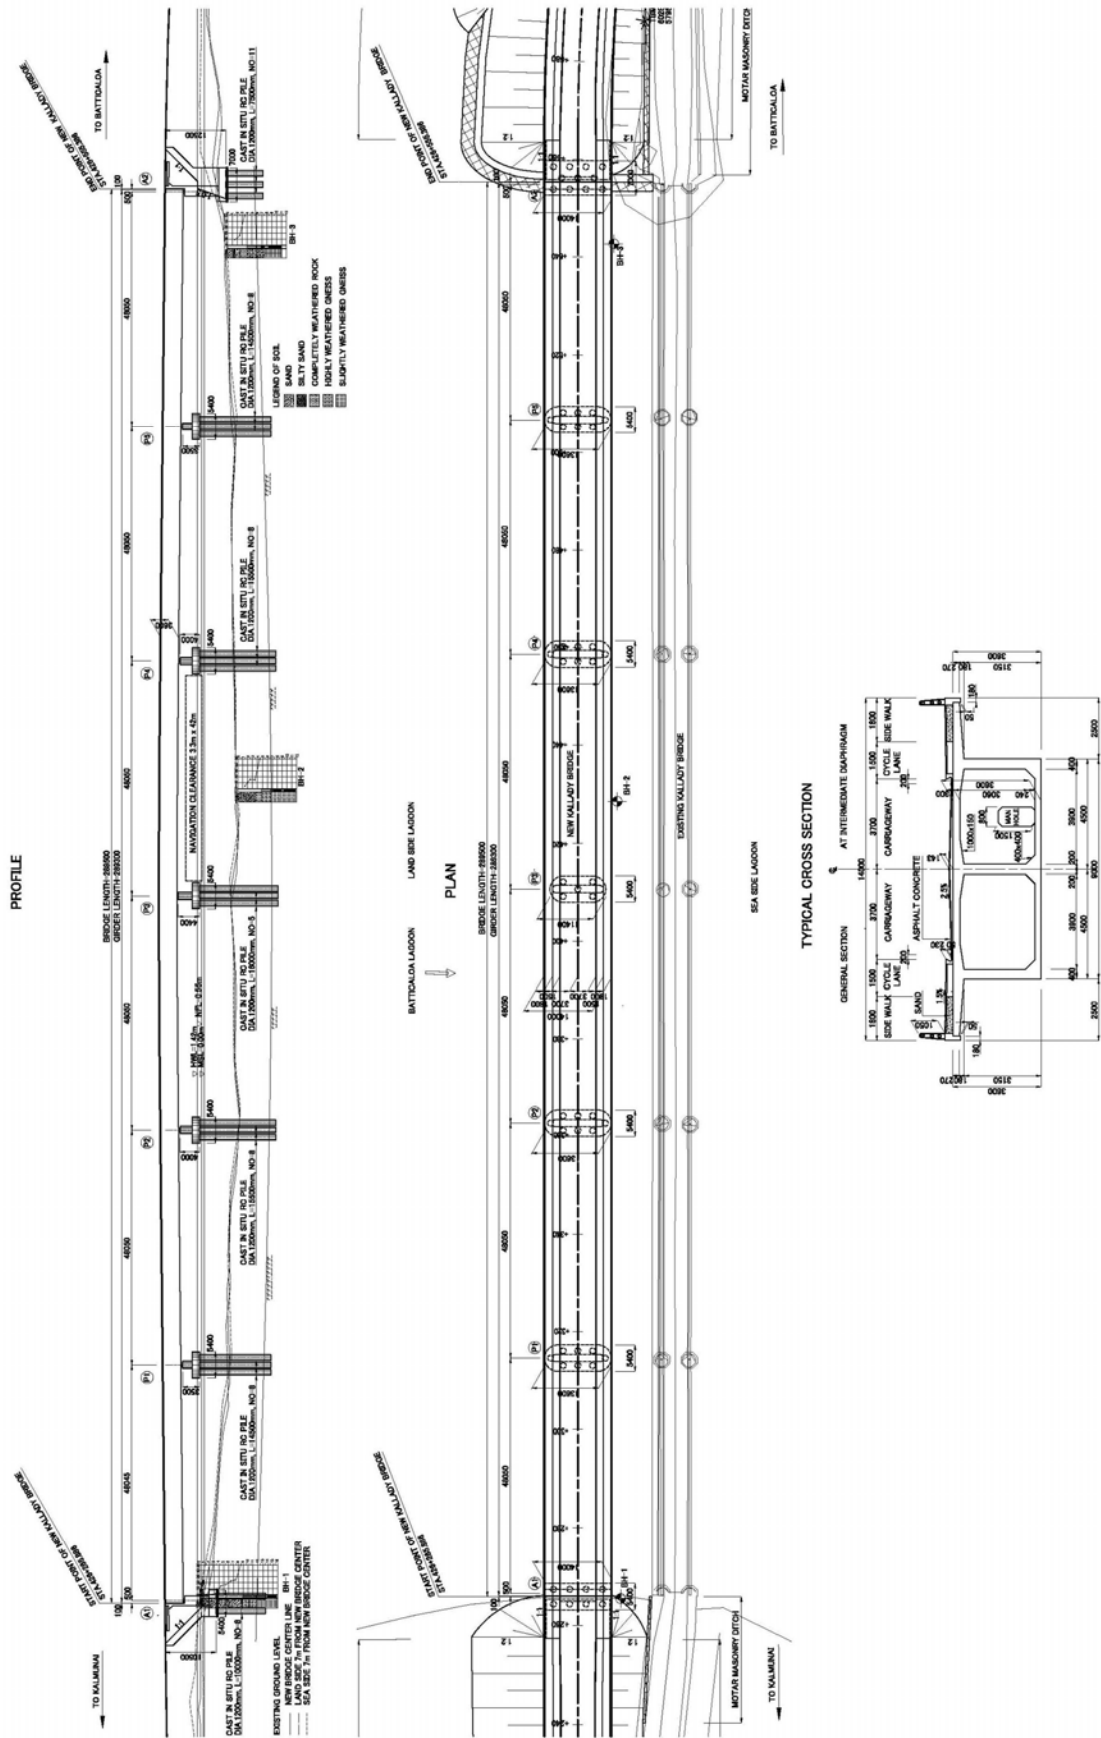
Outline Drawing of New Kallady Bridge
